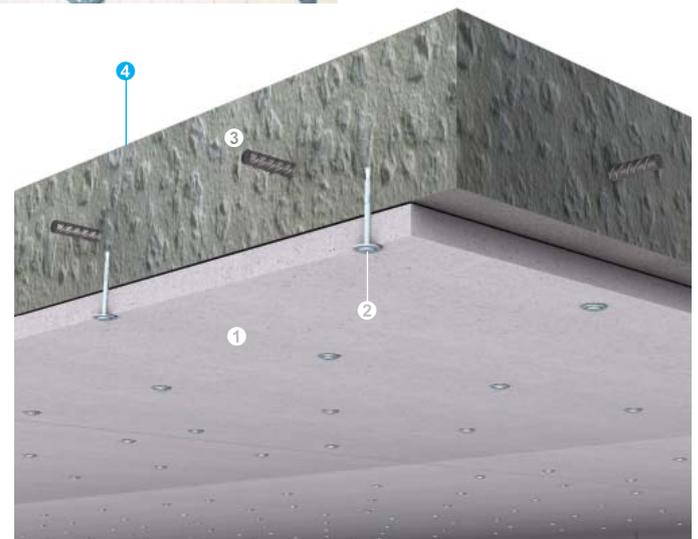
Post construction cladding installation in Zeeburg Tunnel, the Netherlands
